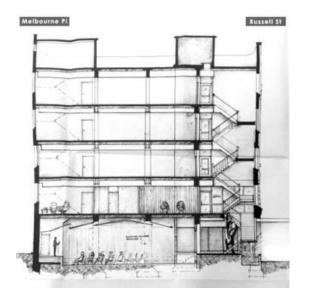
Section drawn by Meldrum Burrows & Partners in 1972. The floor level in the ground floor auditorium was to be lowered and sloped. (PROV Public Building Plan VPRS8044/P/3)
